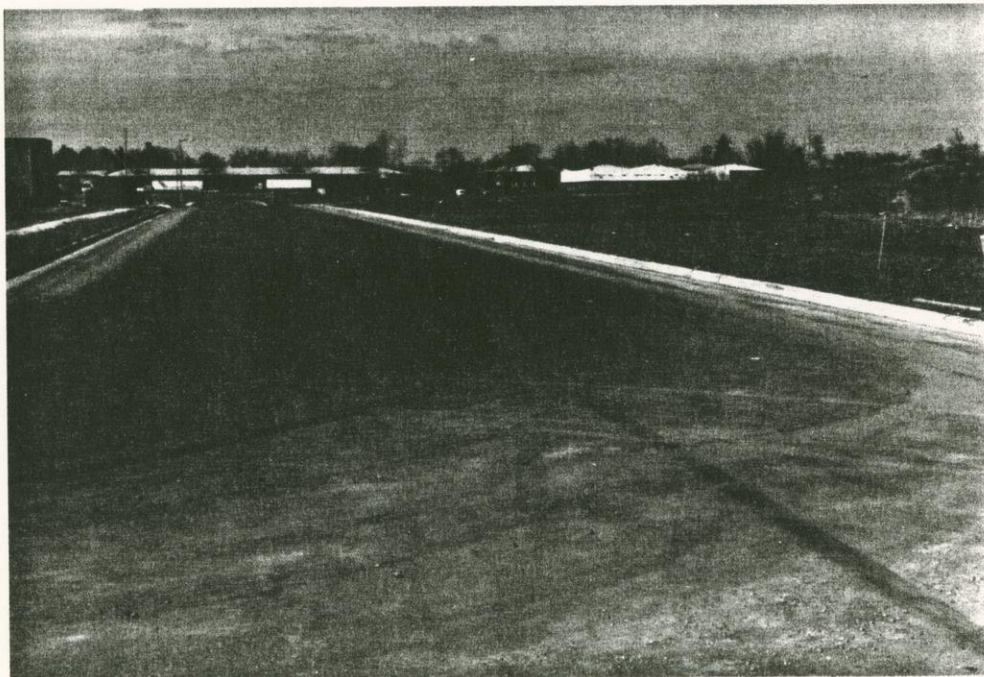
View looking north along Gisholt Drive from Royal Avenue intersection towards West Broadway.
